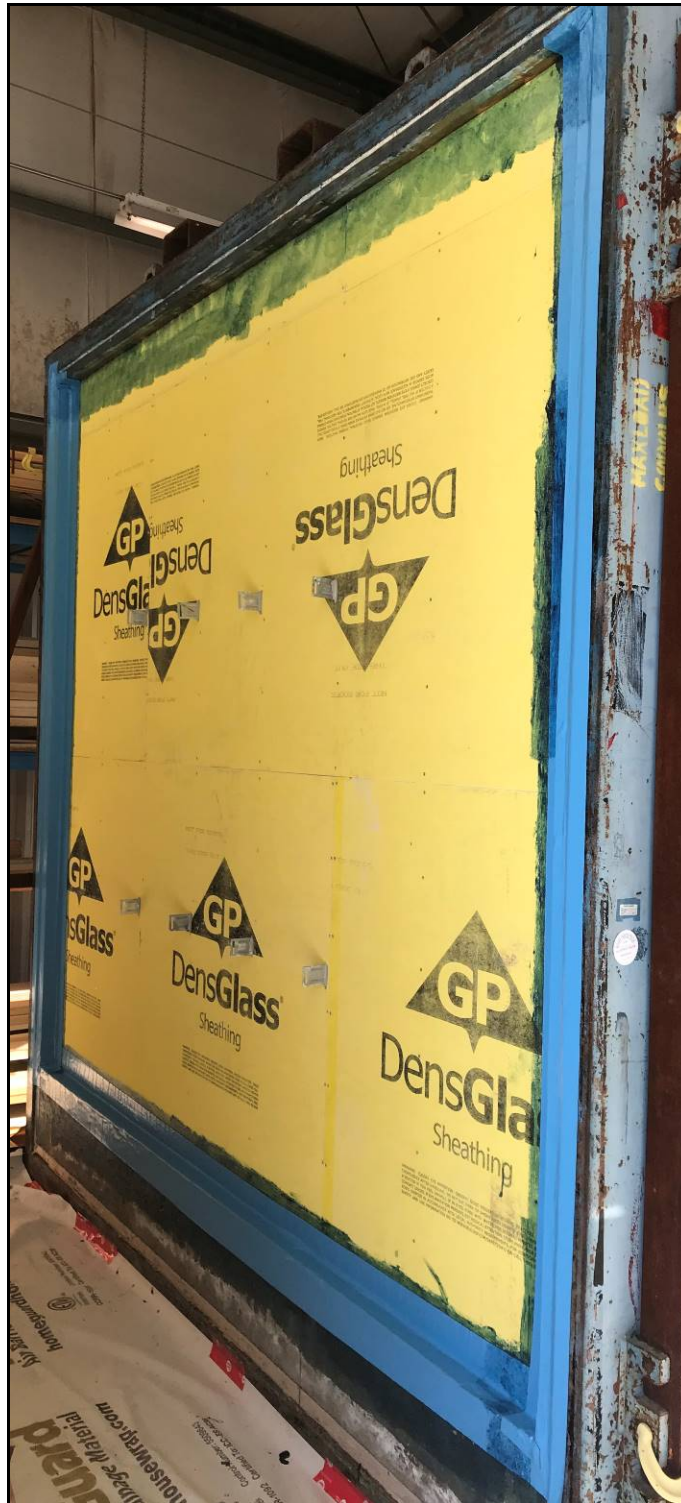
Opaque steel stud with foundation interface wall section; wall perimeter prepared with membrane and brick ties sealed with sealant prior to product application
